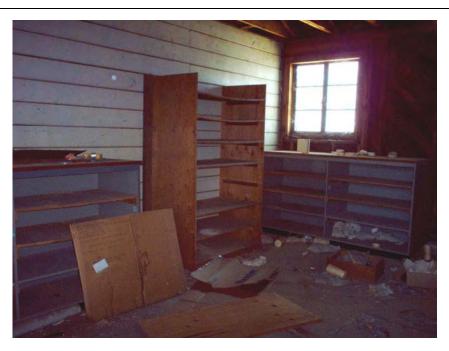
North building, east garage. Discarded equipment and rubbish.
